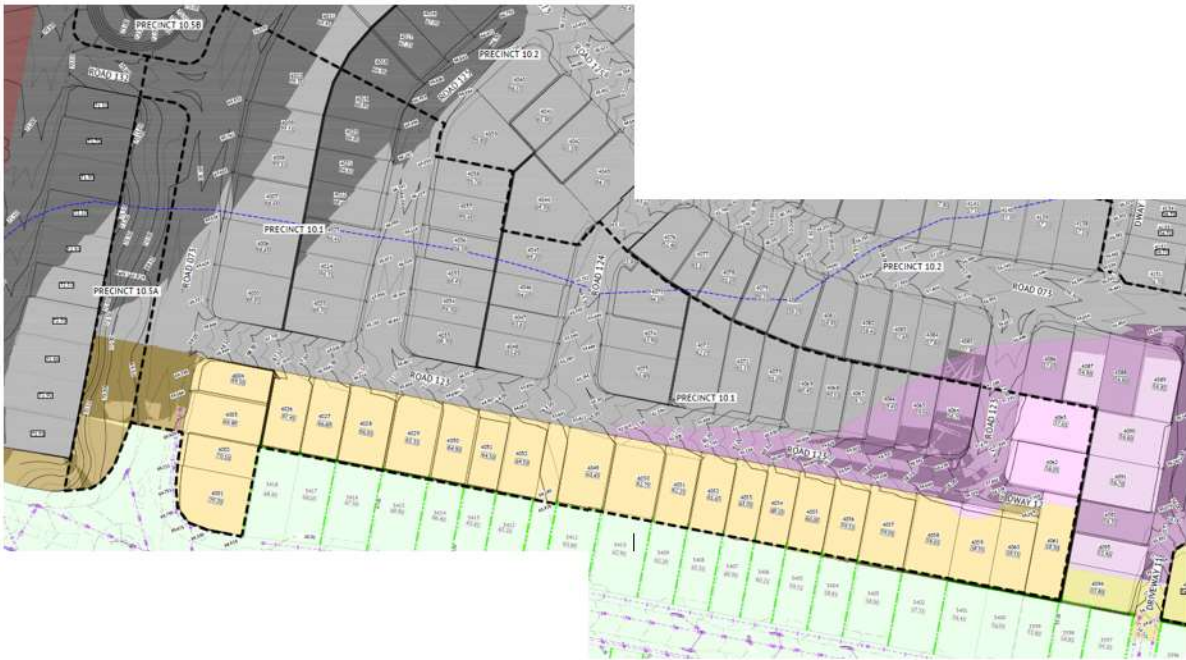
Actual Constructed Area of Fill (600mm BFSL) – Shadforth Survey Plans
